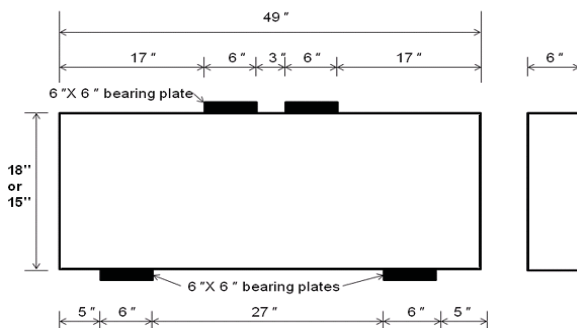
Details of the sizes of beam specimens, bearing plates, loading pattern and span lengths for the test
